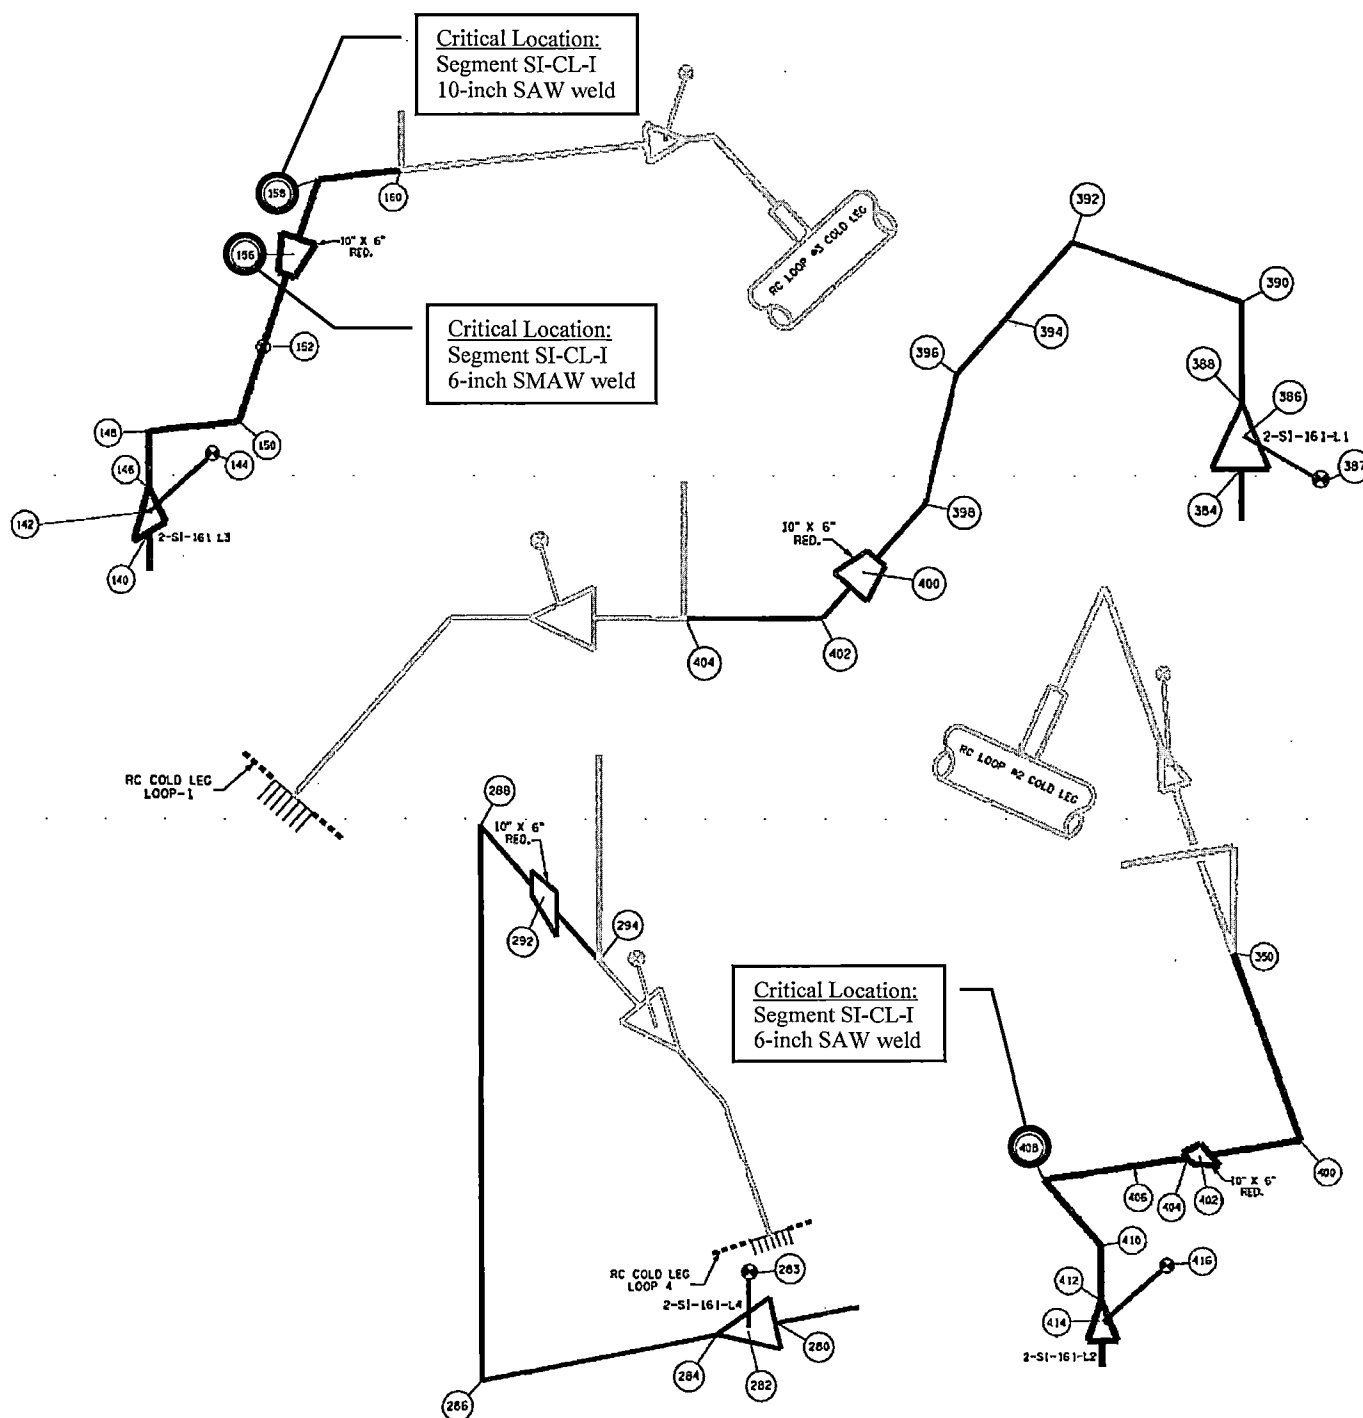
D.C. Cook Unit 2 Cold Leg SI Line Critical Weld Locations
